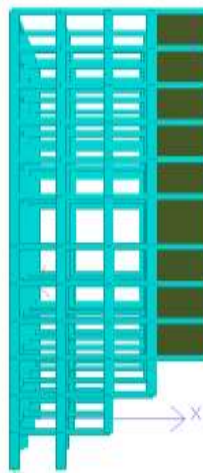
Side view of Hostel no. 05 with Shear Walls
